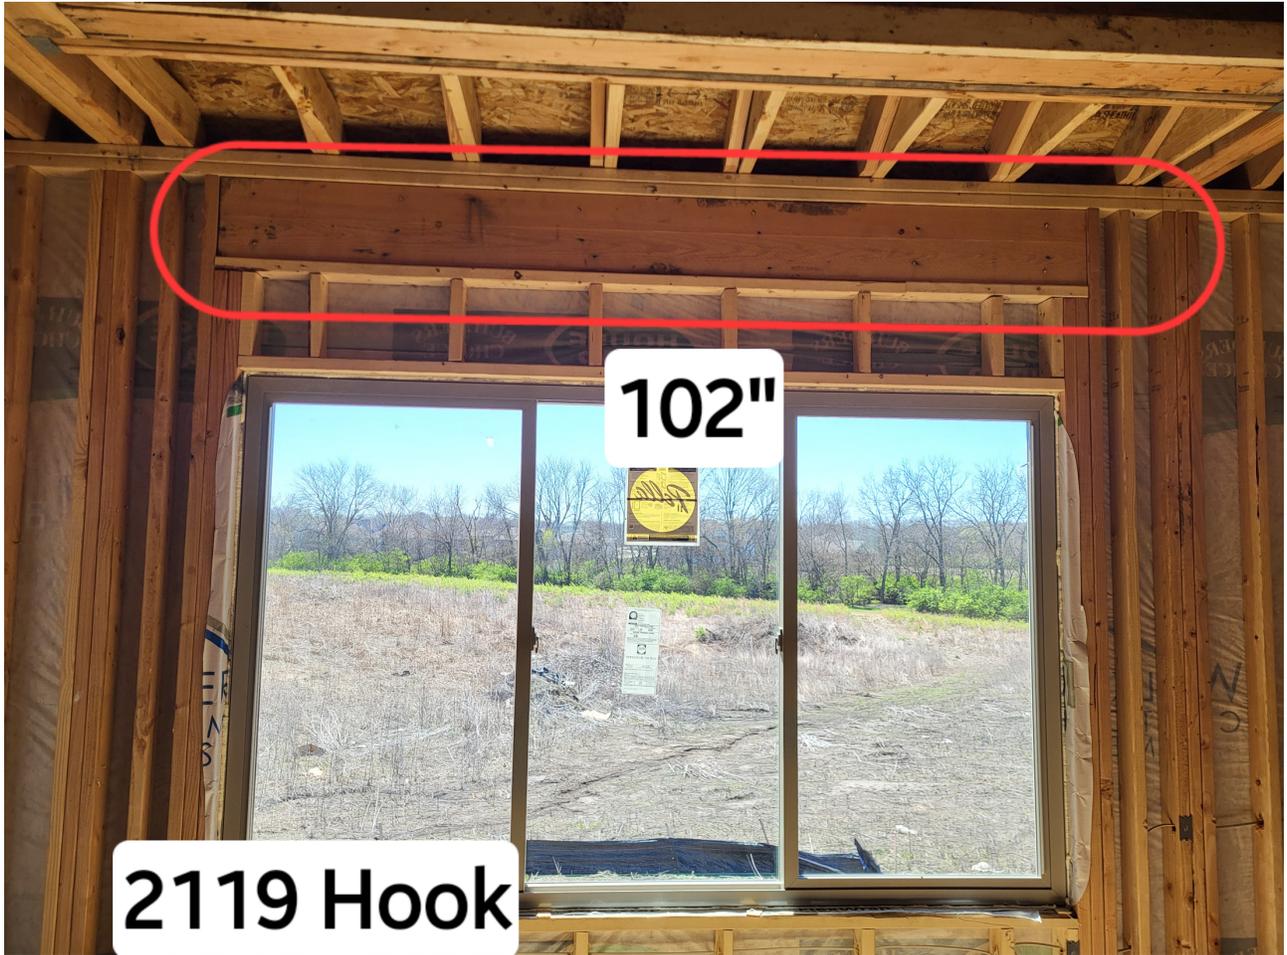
MASTER BEDROOM WINDOW HEADER
